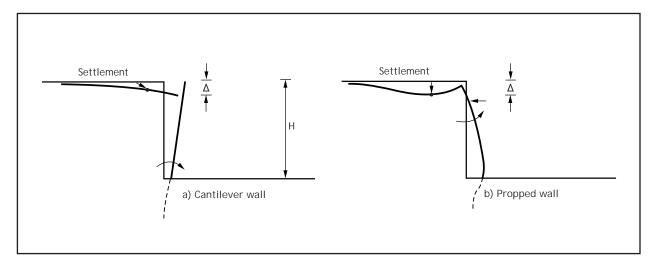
Effect of horizontal load relief on (a) a cantilever wall and (b) a propped (or tied-back) wall.
